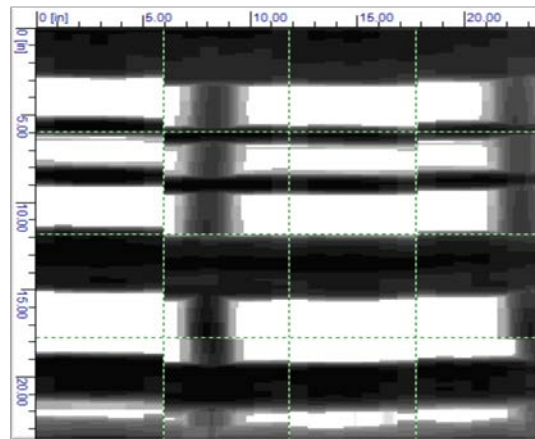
Imagescan on bottom side of exterior beam (Bridge 7722).
